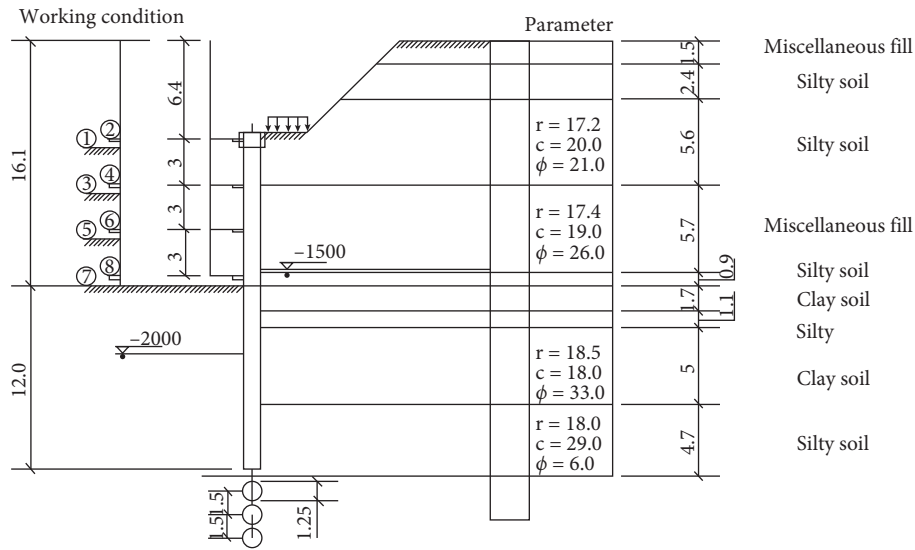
Schematic diagram of pile slab retaining wall (unit: m).
